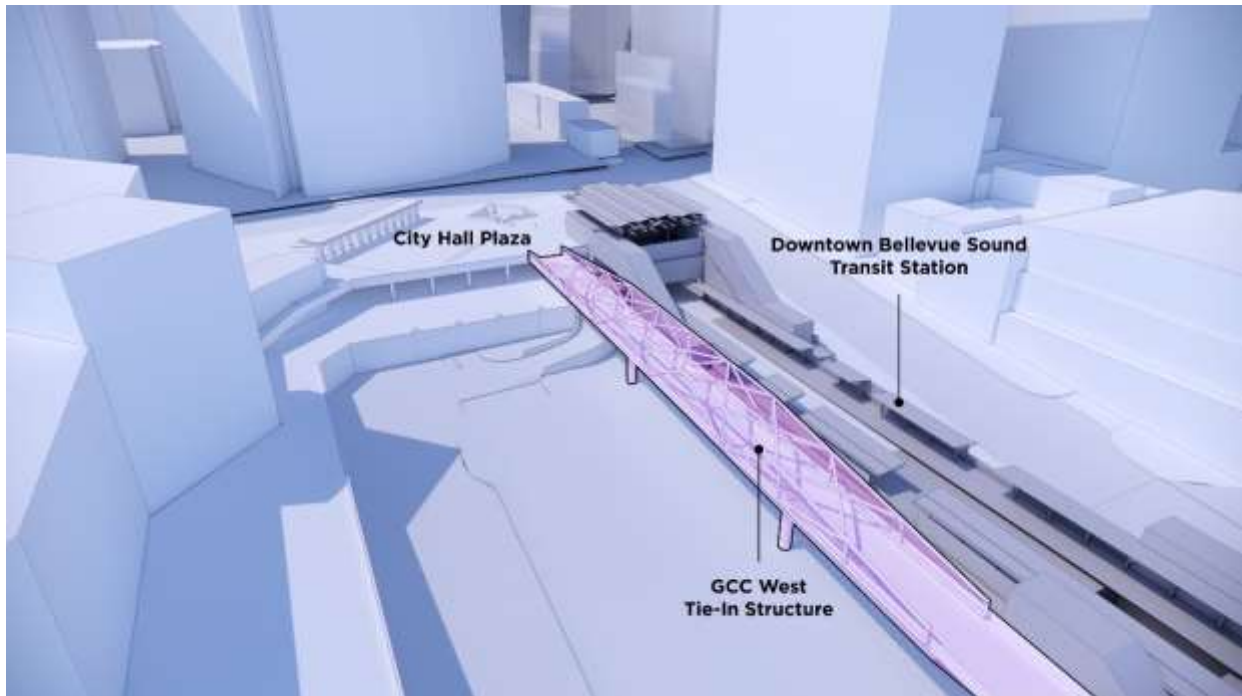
Conceptual rendering of west tie-in structure, Steel Truss Cantilever.
